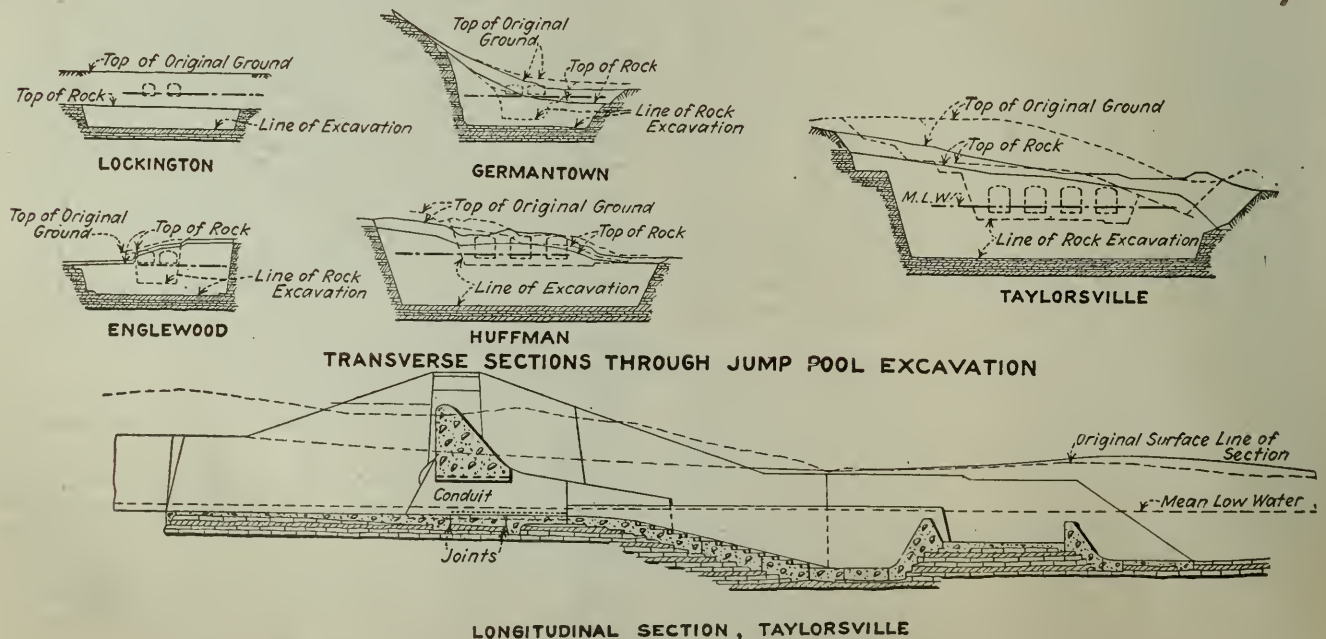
TYPICAL SECTIONS OF ROCK CUTS FOR OUTLET CHANNELS
